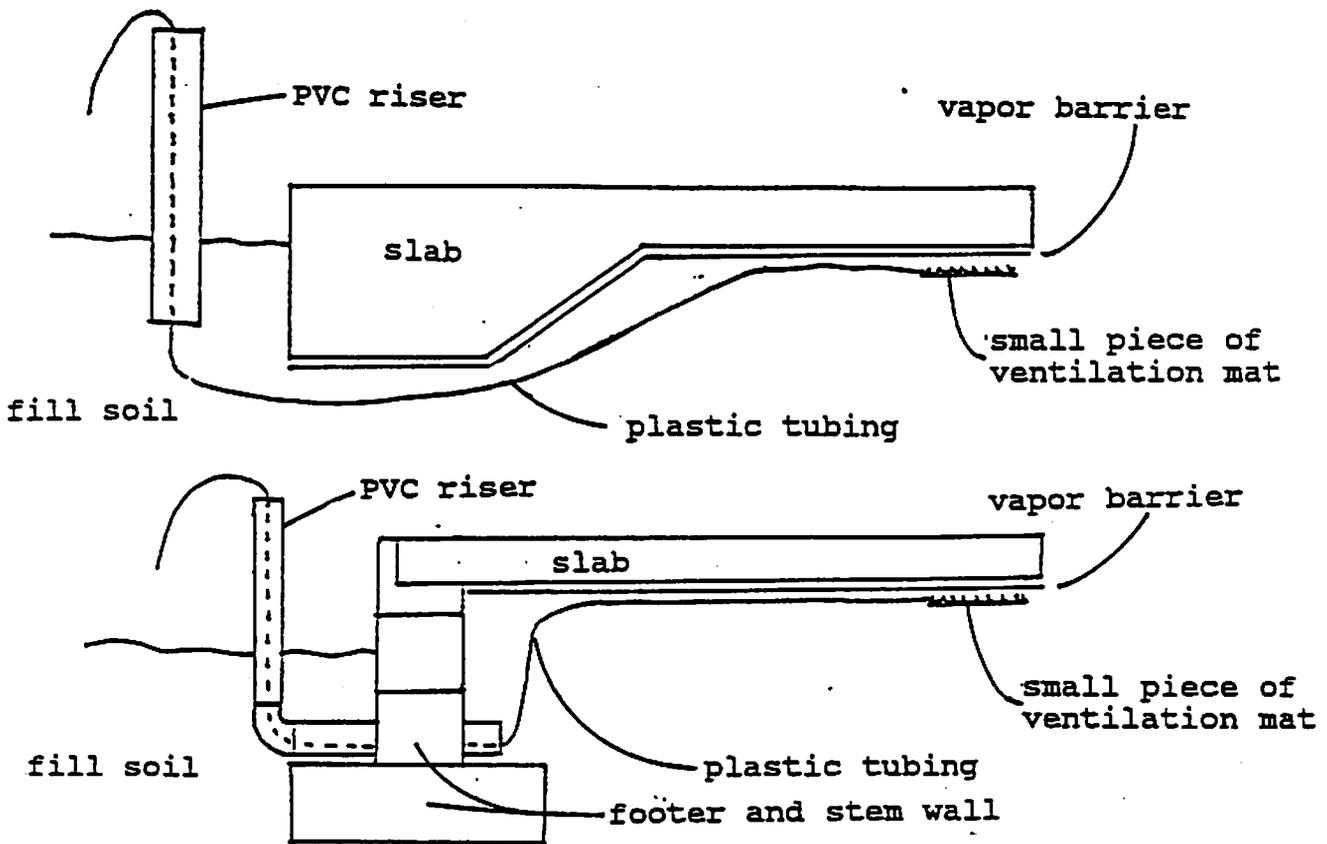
Variations of tube installation for monolithic and stem wall slabs.
